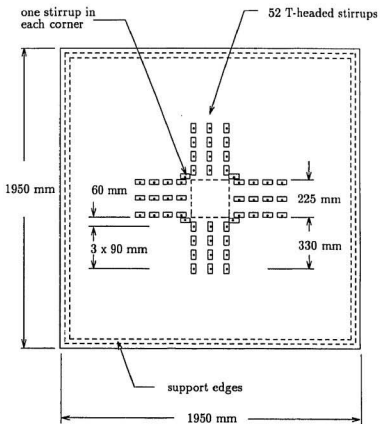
Arrangement of T-headed shear reinforcement in Slab HS23
